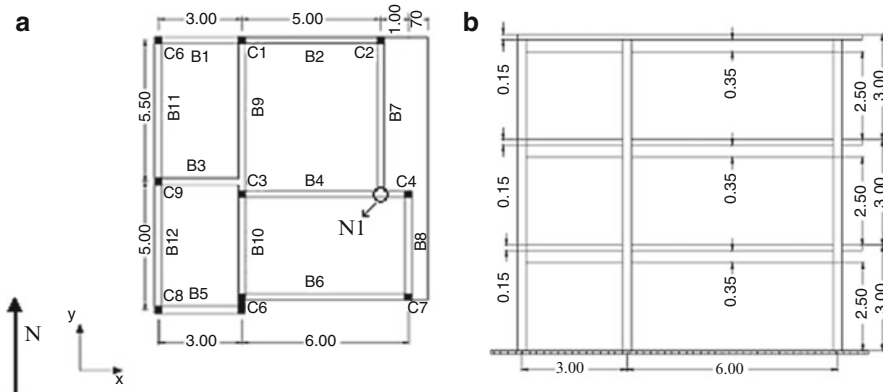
Three-storey building configuration. (a) In plan and (b) at the southwest facade (units in metres)
